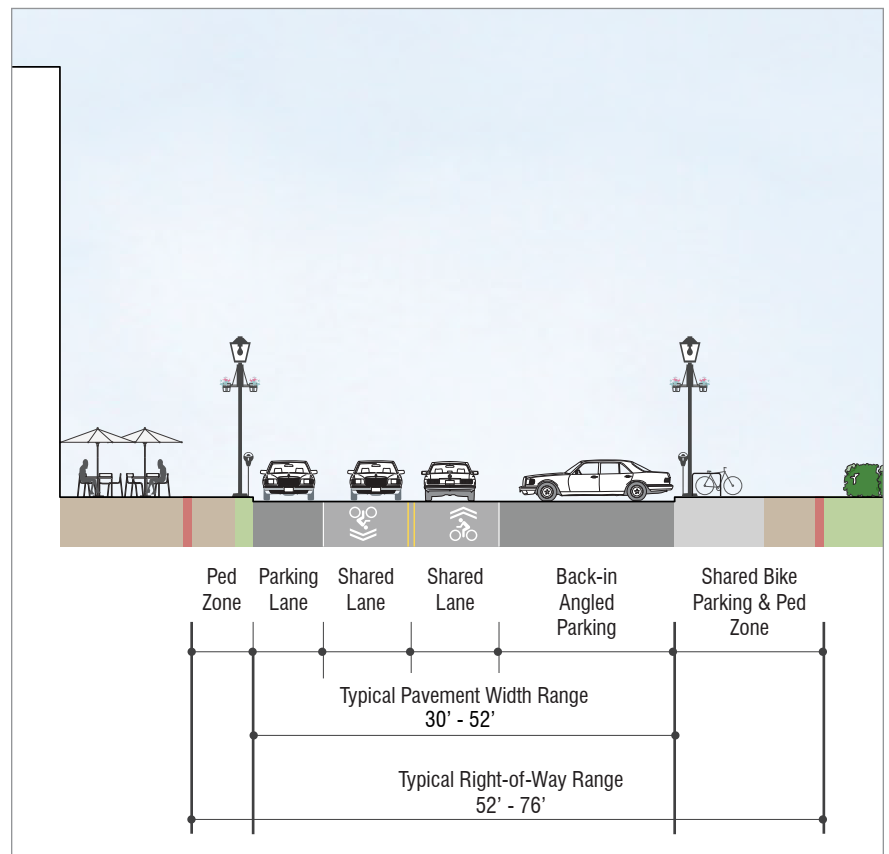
Typical Existing Street Section for "Village Main Street" Typology
